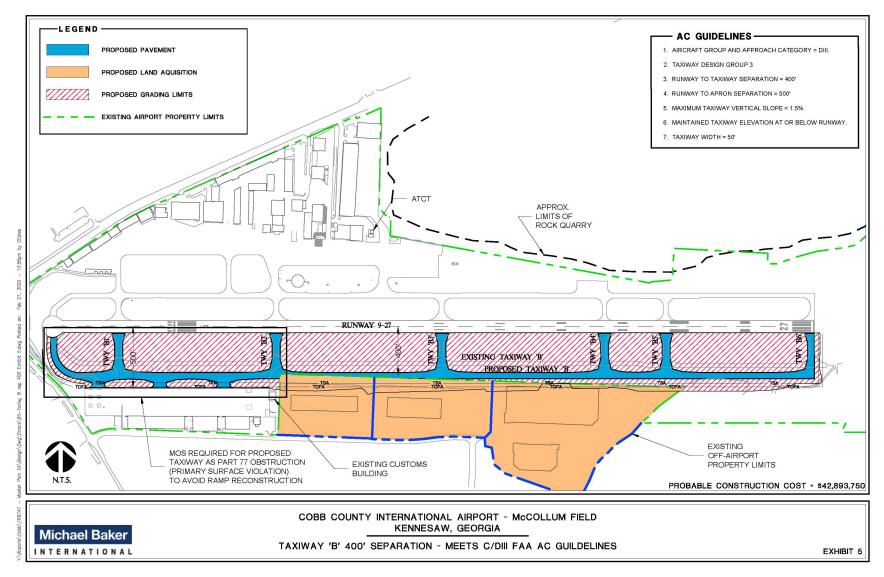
Taxiway 'B' Relocation, Alternative 3b (400-foot Runway/Taxiway Separation)
